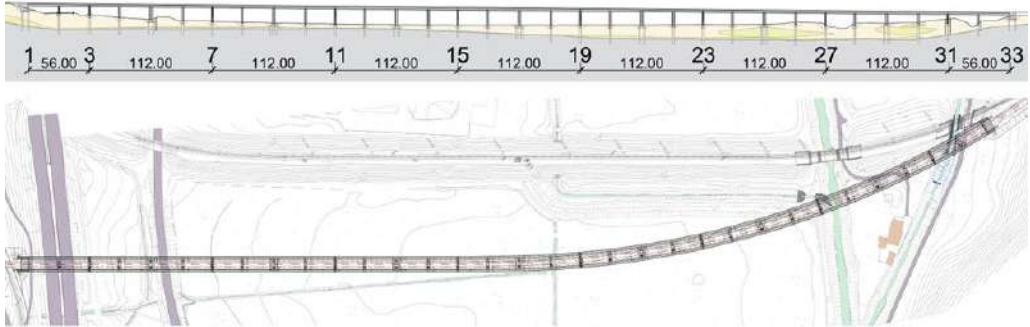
Longitudinal section and layout - the viaduct is divided into 9 parts
